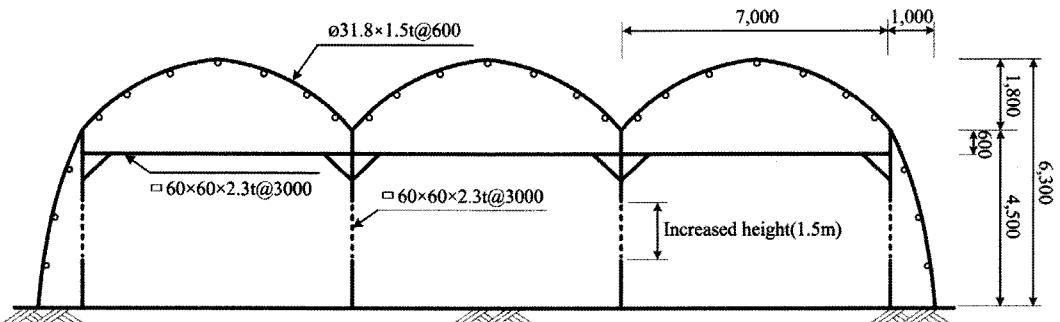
Elevated eaves height 1-2W type plastic greenhouse with 3.0m of column spacing.
